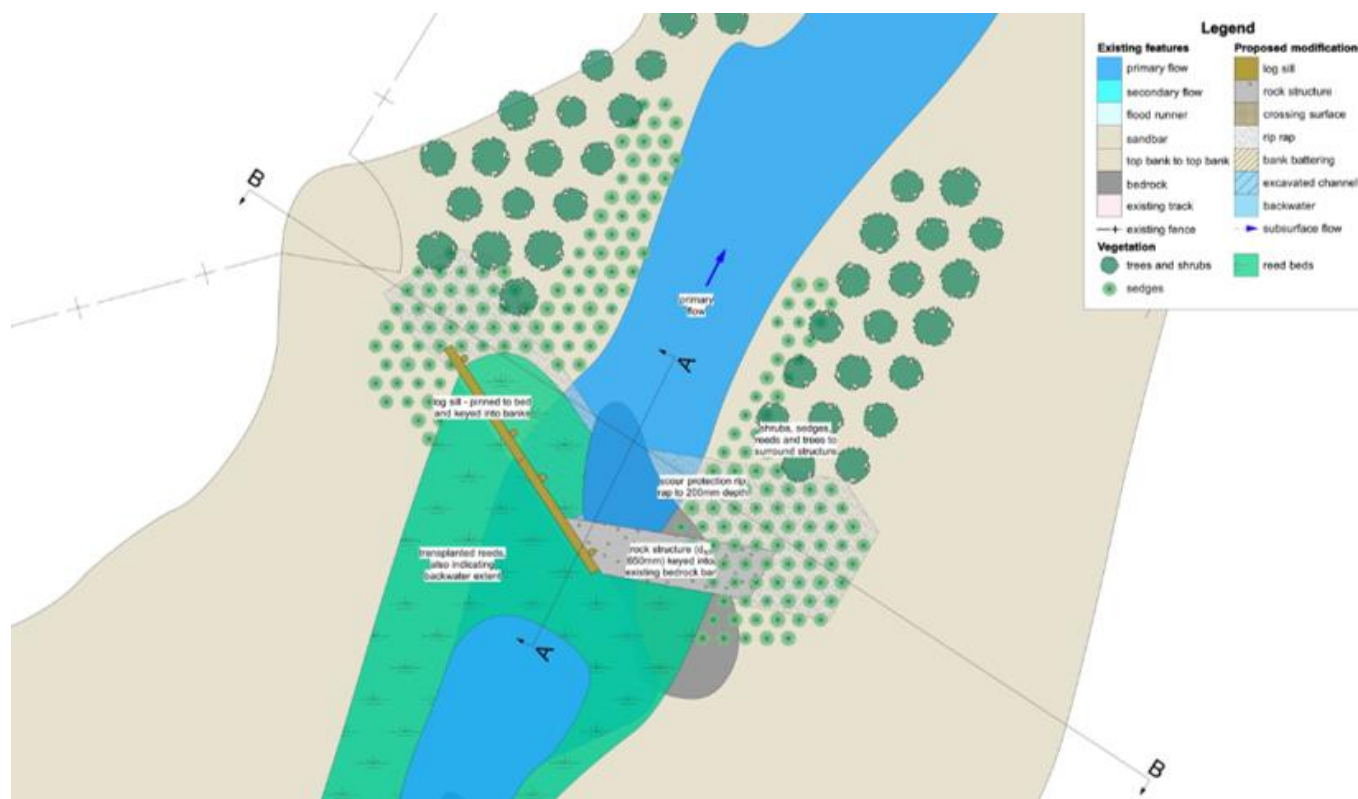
Design example of a landscape rehydration infrastructure (Image source: © The Mulloon Institute)
